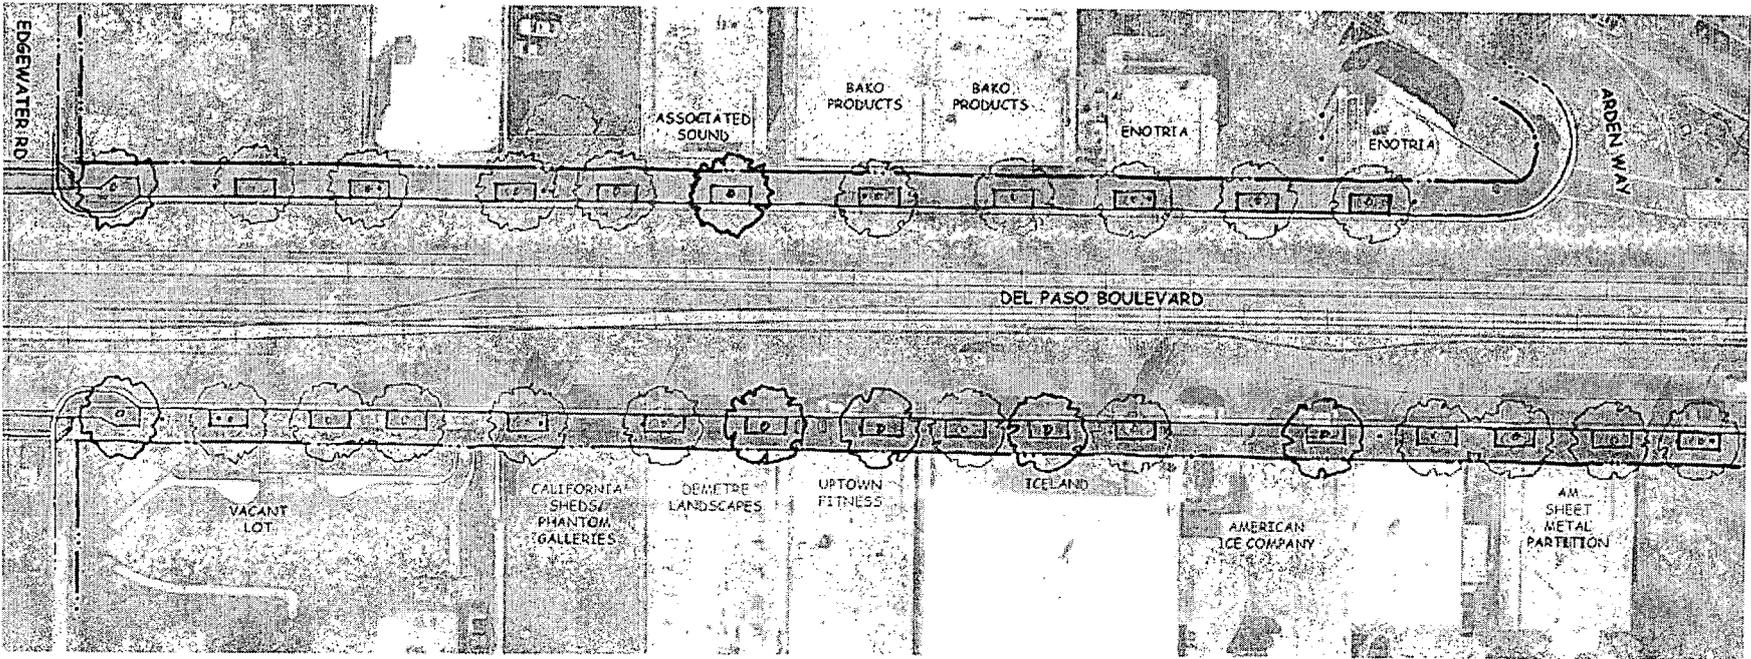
% Design Plans – Edgewater Road to Arden Way
